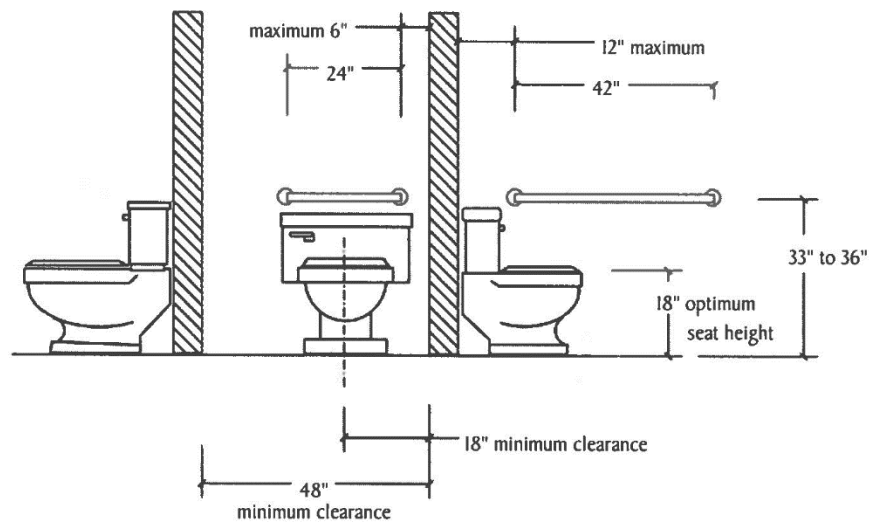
Accessible Bathroom Dimensions – Elevation
